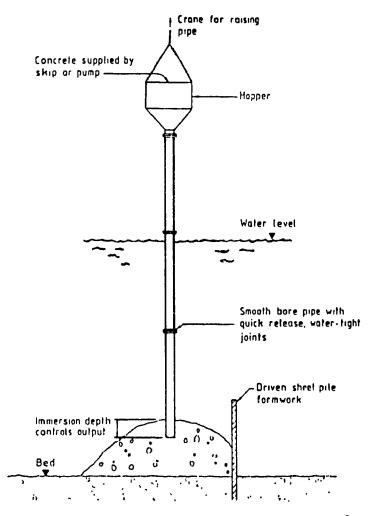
TYPICAL TREMIE PIPE ARRANGEMENT<sup>2</sup>
